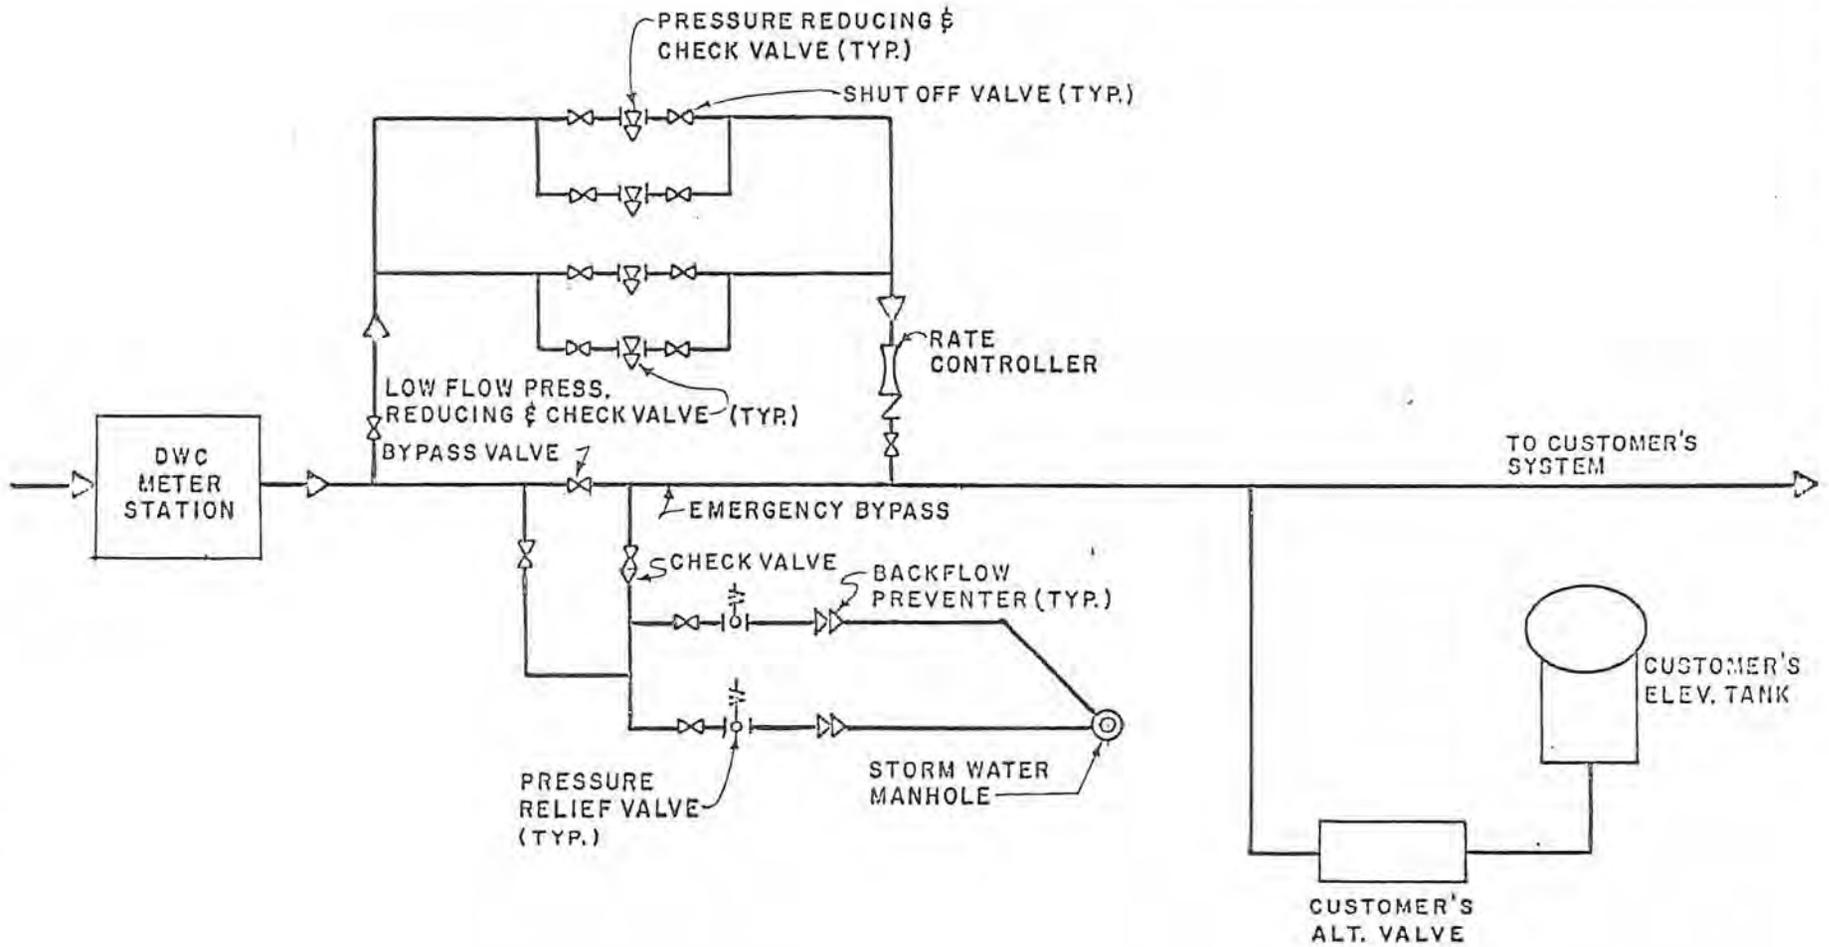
MONTGOMERY UNIT SYSTEM CONNECTION FACILITIES
